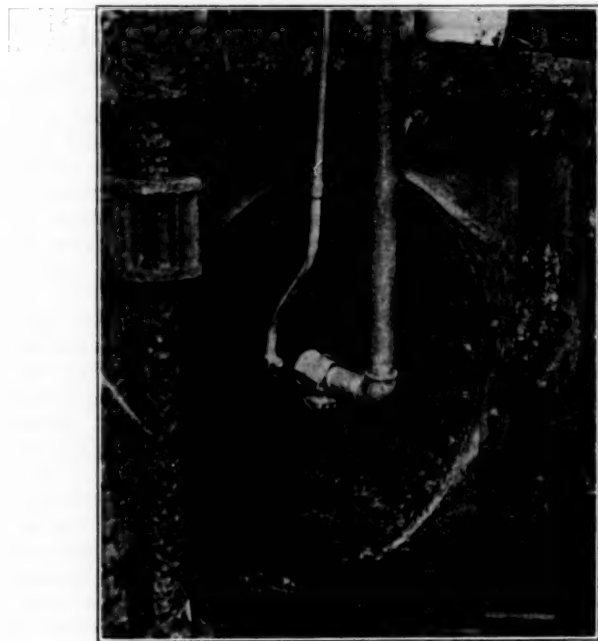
HEAD GATE, MOUTH OF PENSTOCK AND 2-IN. QUICK-ACTING VALVE
